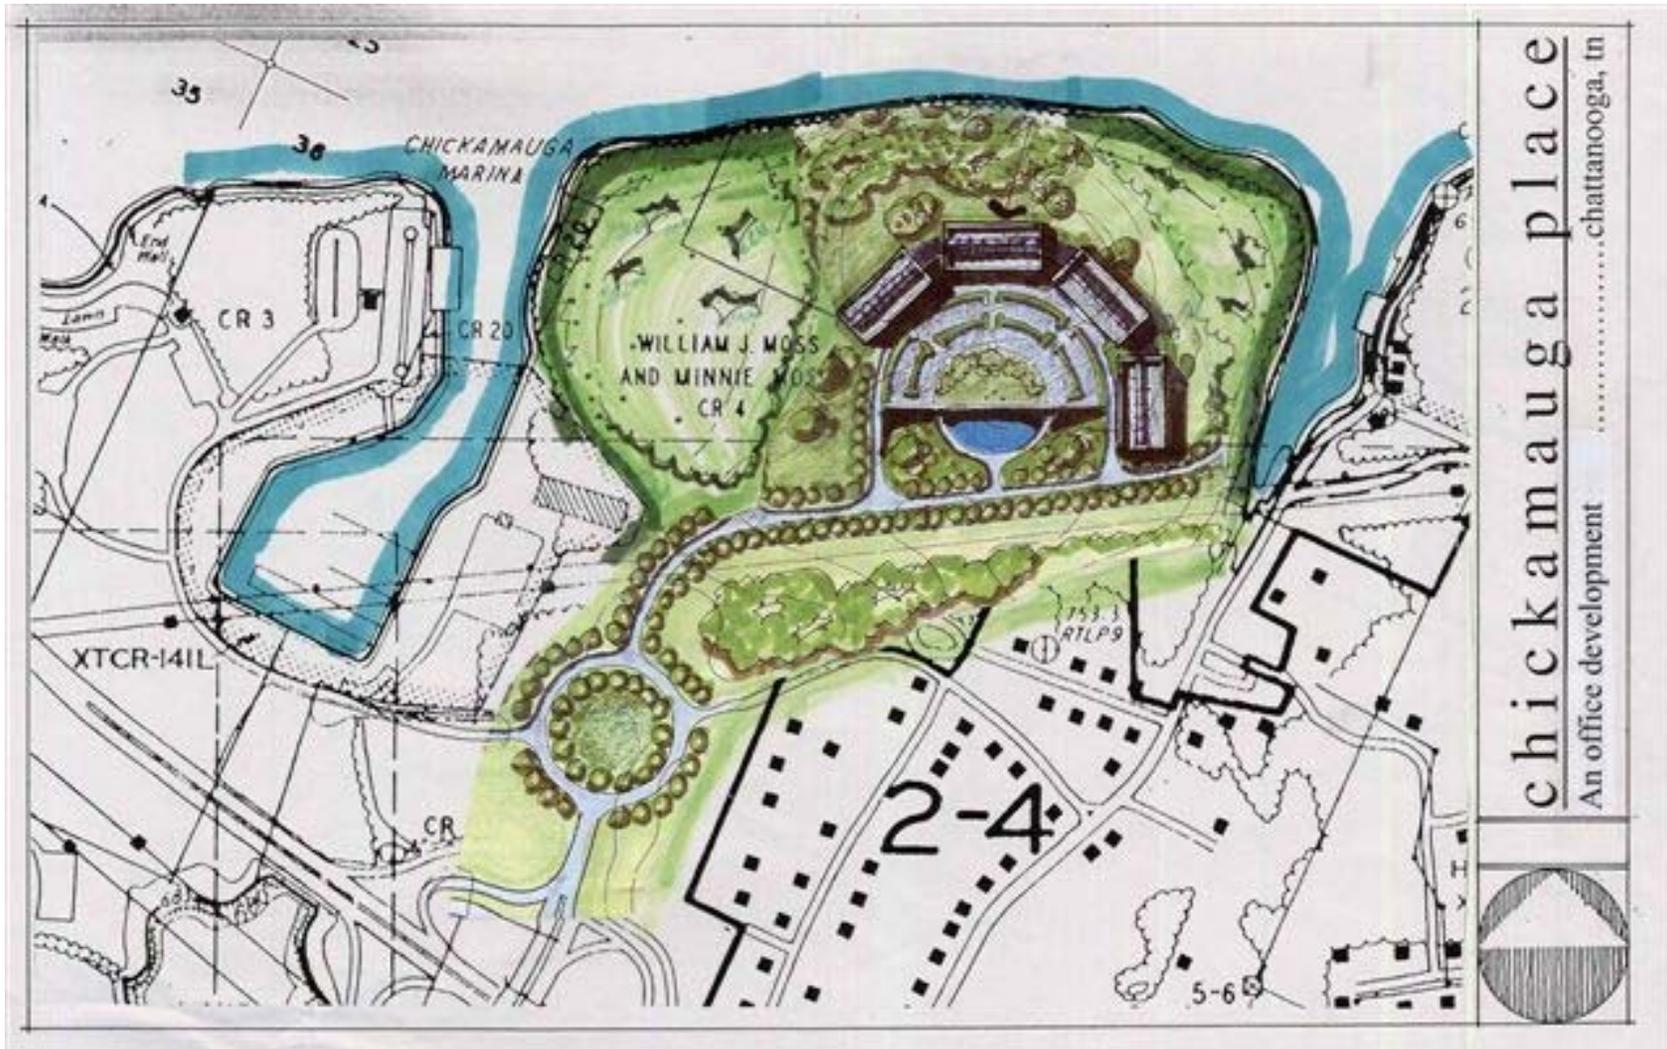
Conceptual Plan of Proposed TVA Office Complex at Chickamauga Dam Reservation
